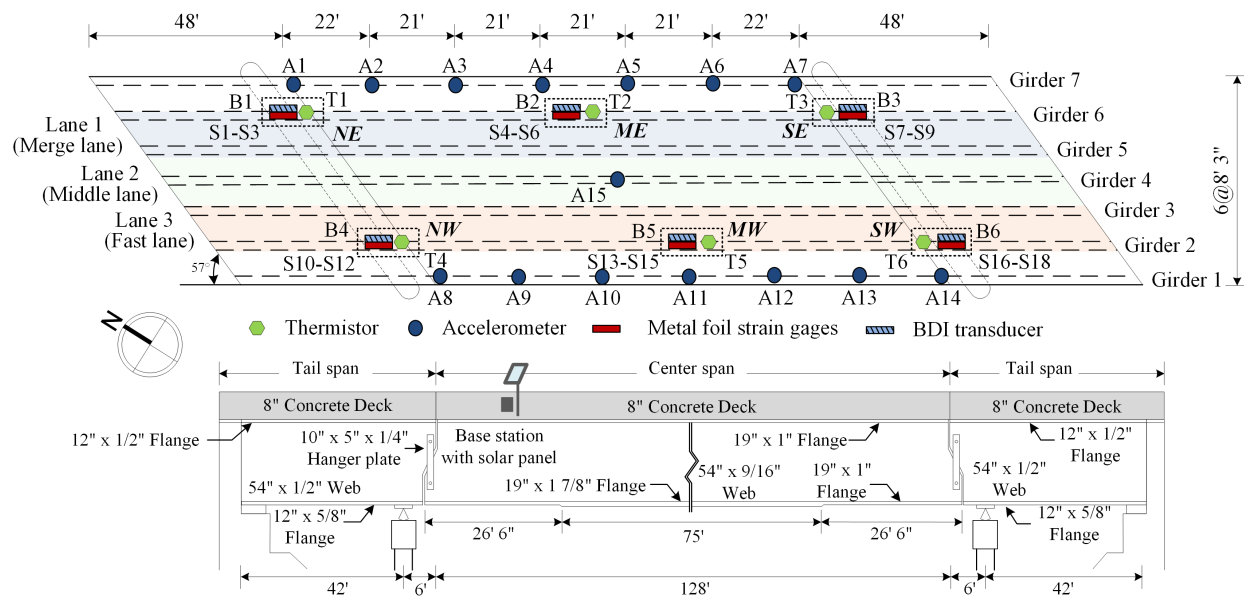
Sensor layout of the wireless sensing network drawn on the schematic diagram of the Telegraph Road Bridge with sensor types and location convention defined.
